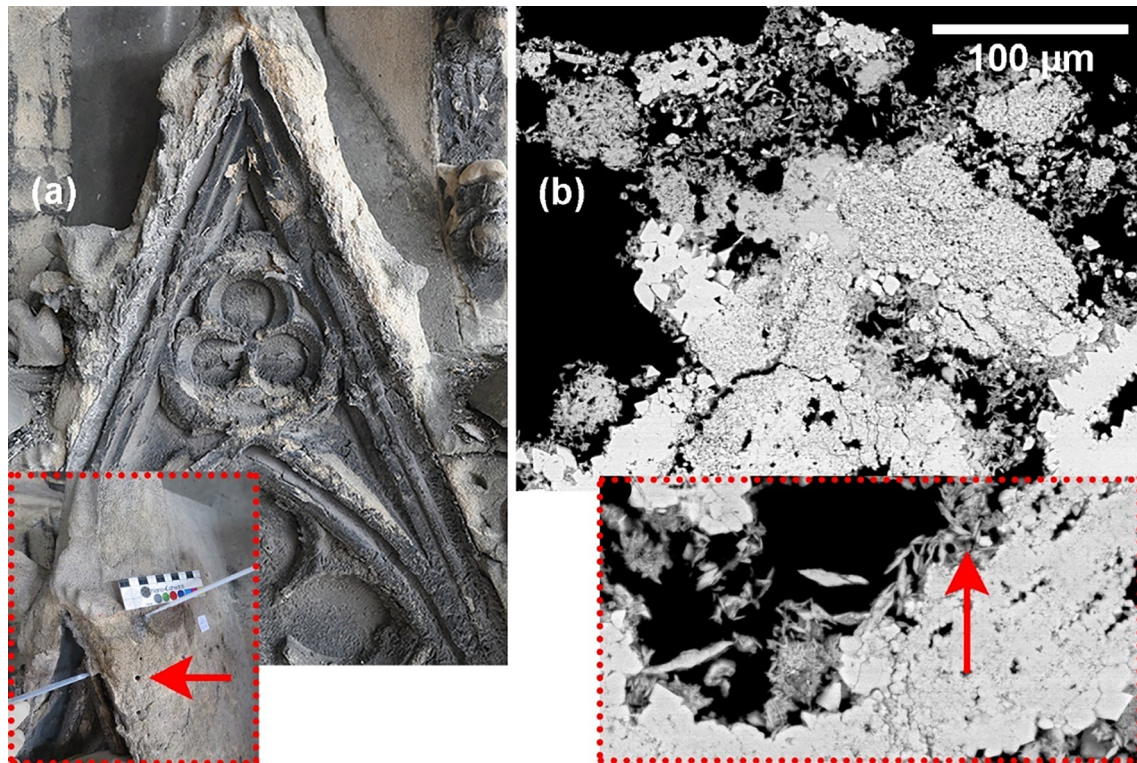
a) Architectural element on the south façade of St. Stephen's Cathedral used as the testing area. Inset shows the surface during application of a consolidant and the drilling resistance holes made for the purpose of testing the condition prior to treatment (red arrow). b) Typical decay pattern, observed in back-scattered mode on polished thin sections, exhibiting damage more pronounced at the surface. Inset shows the presence of gypsum in the microstructure, visible in the form of needles (red arrow). (For interpretation of the references to colour in this figure legend, the reader is referred to the web version of this article.)
